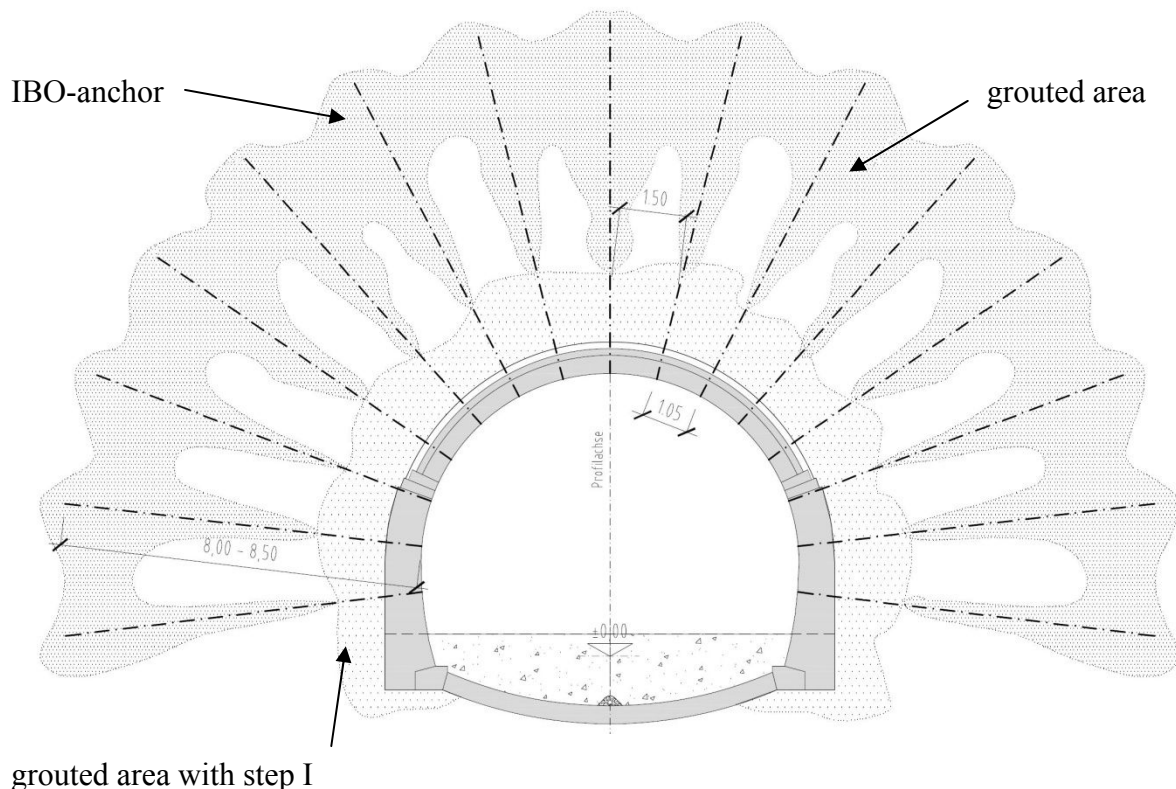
, grouting via IBO-anchor (source Beton- und Monierbau)
